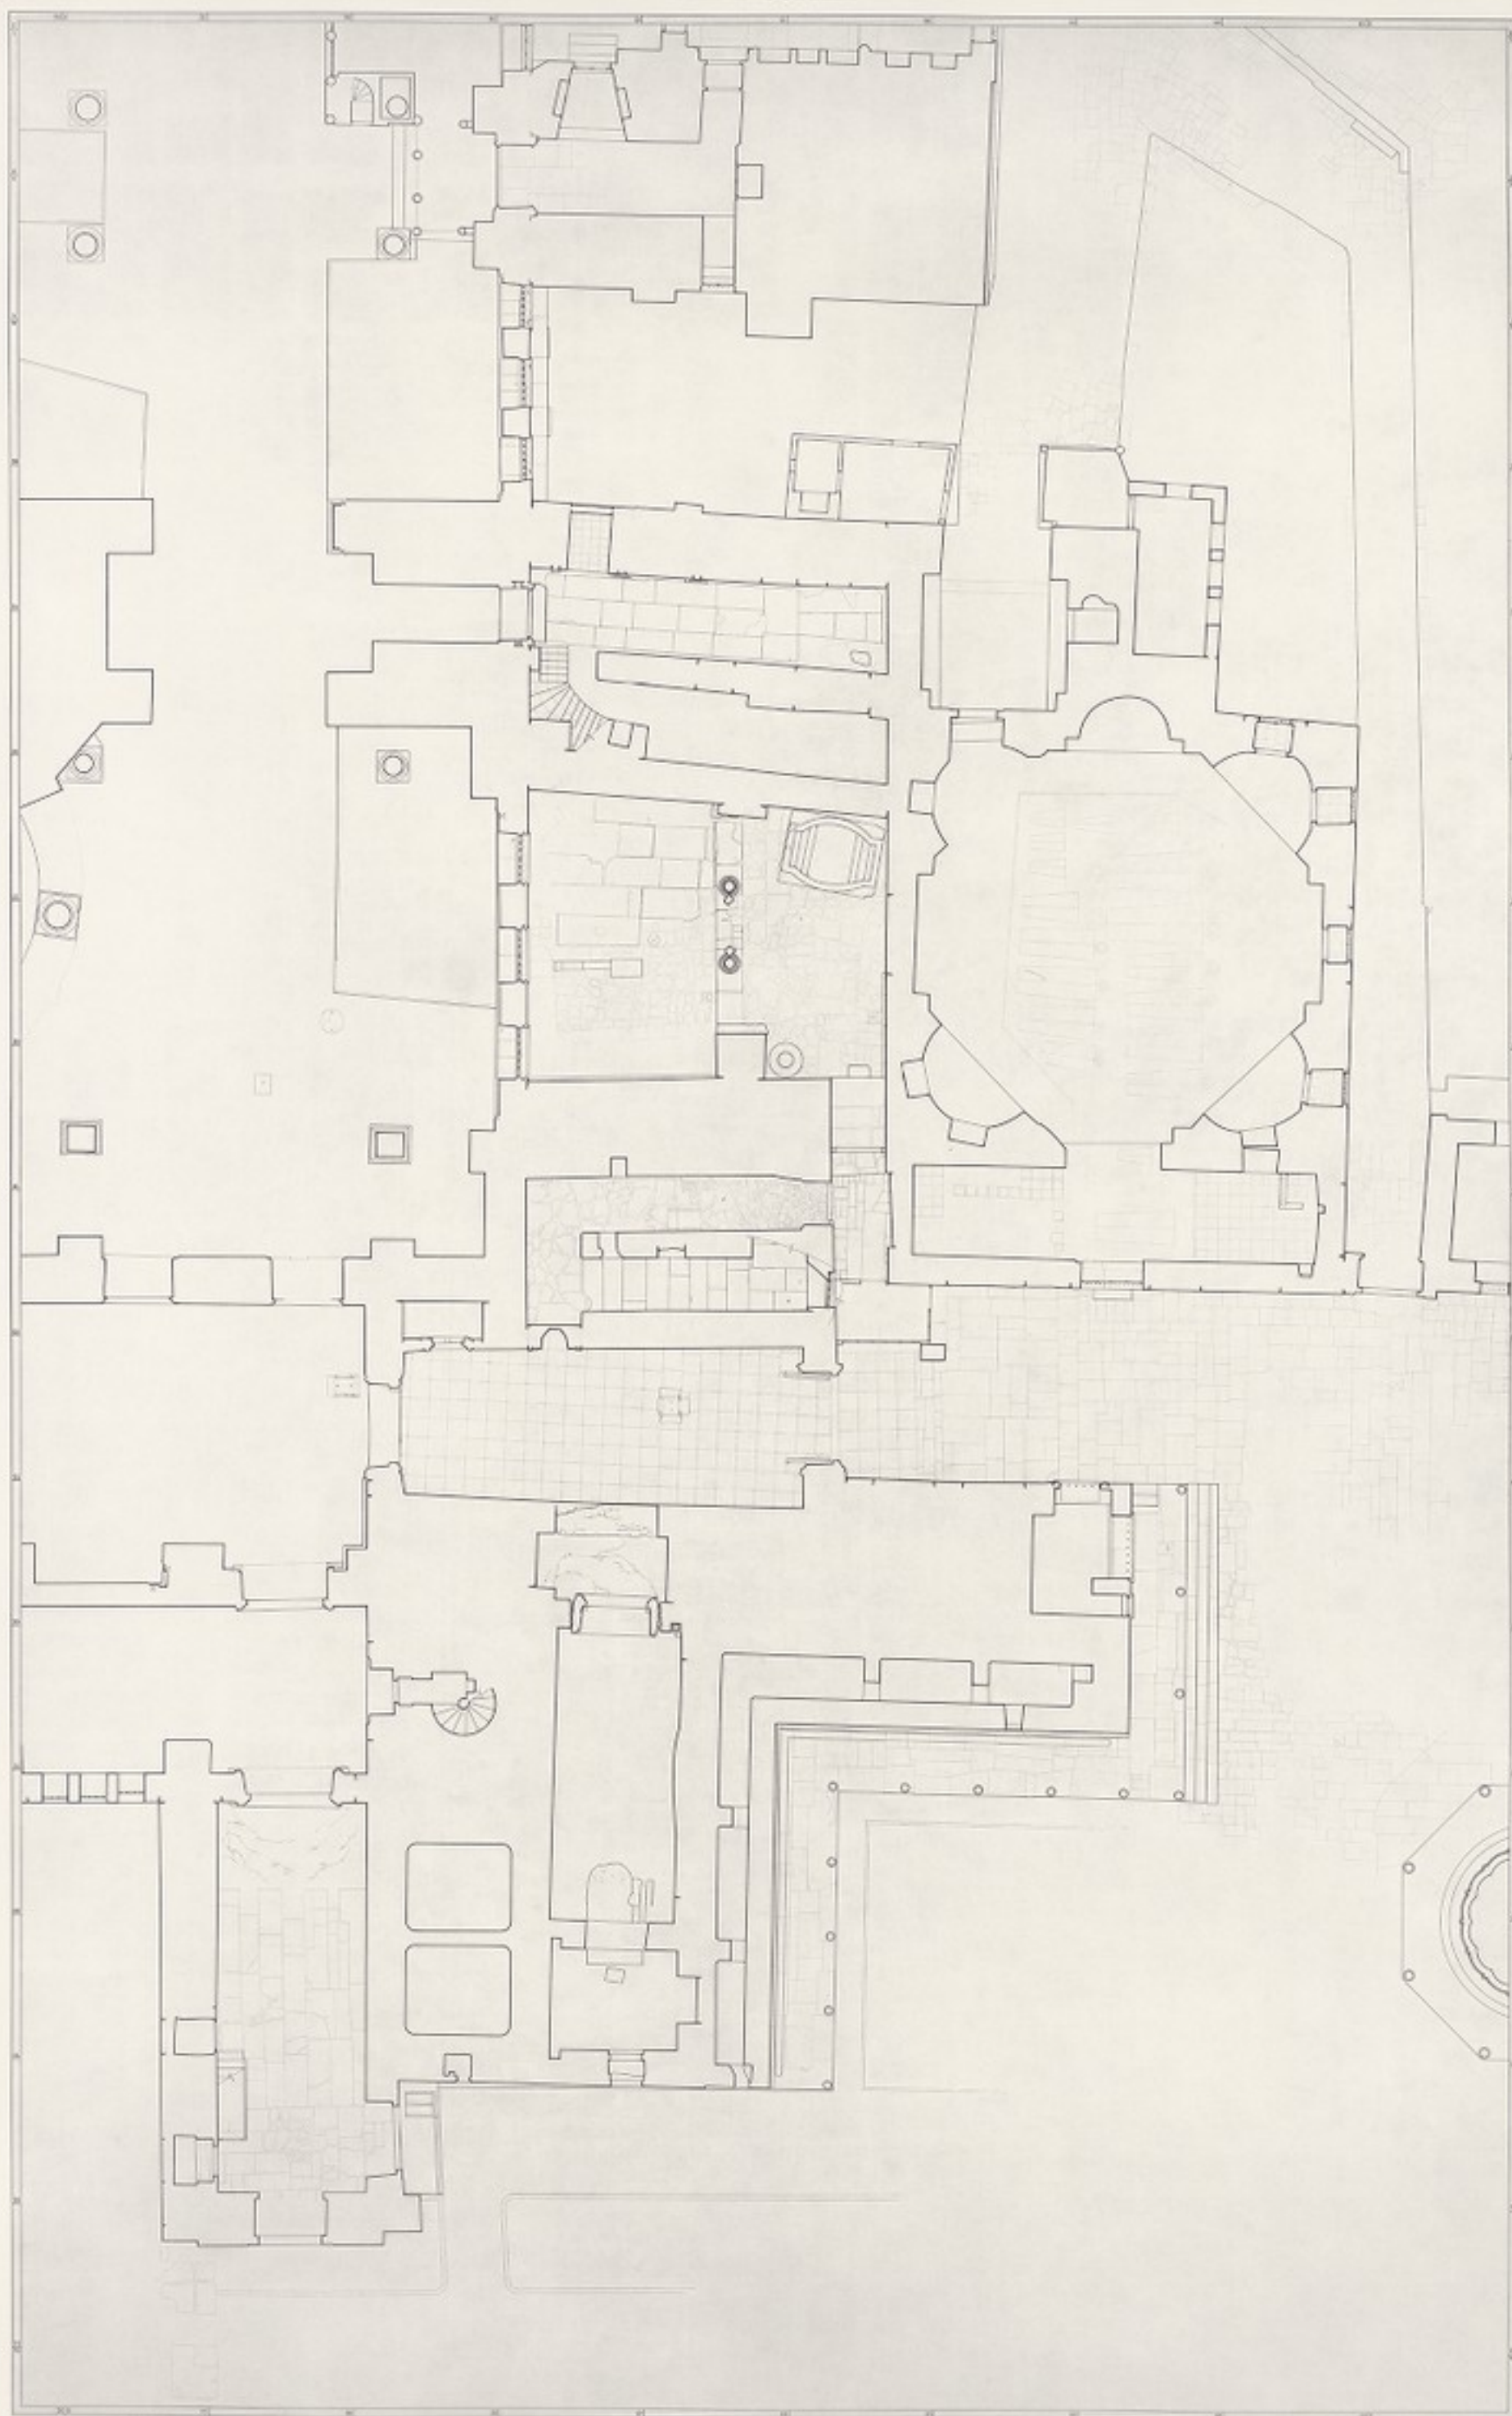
PLAN AT GROUND LEVEL, SOUTHWESTERN EXTERIOR AREAS:
